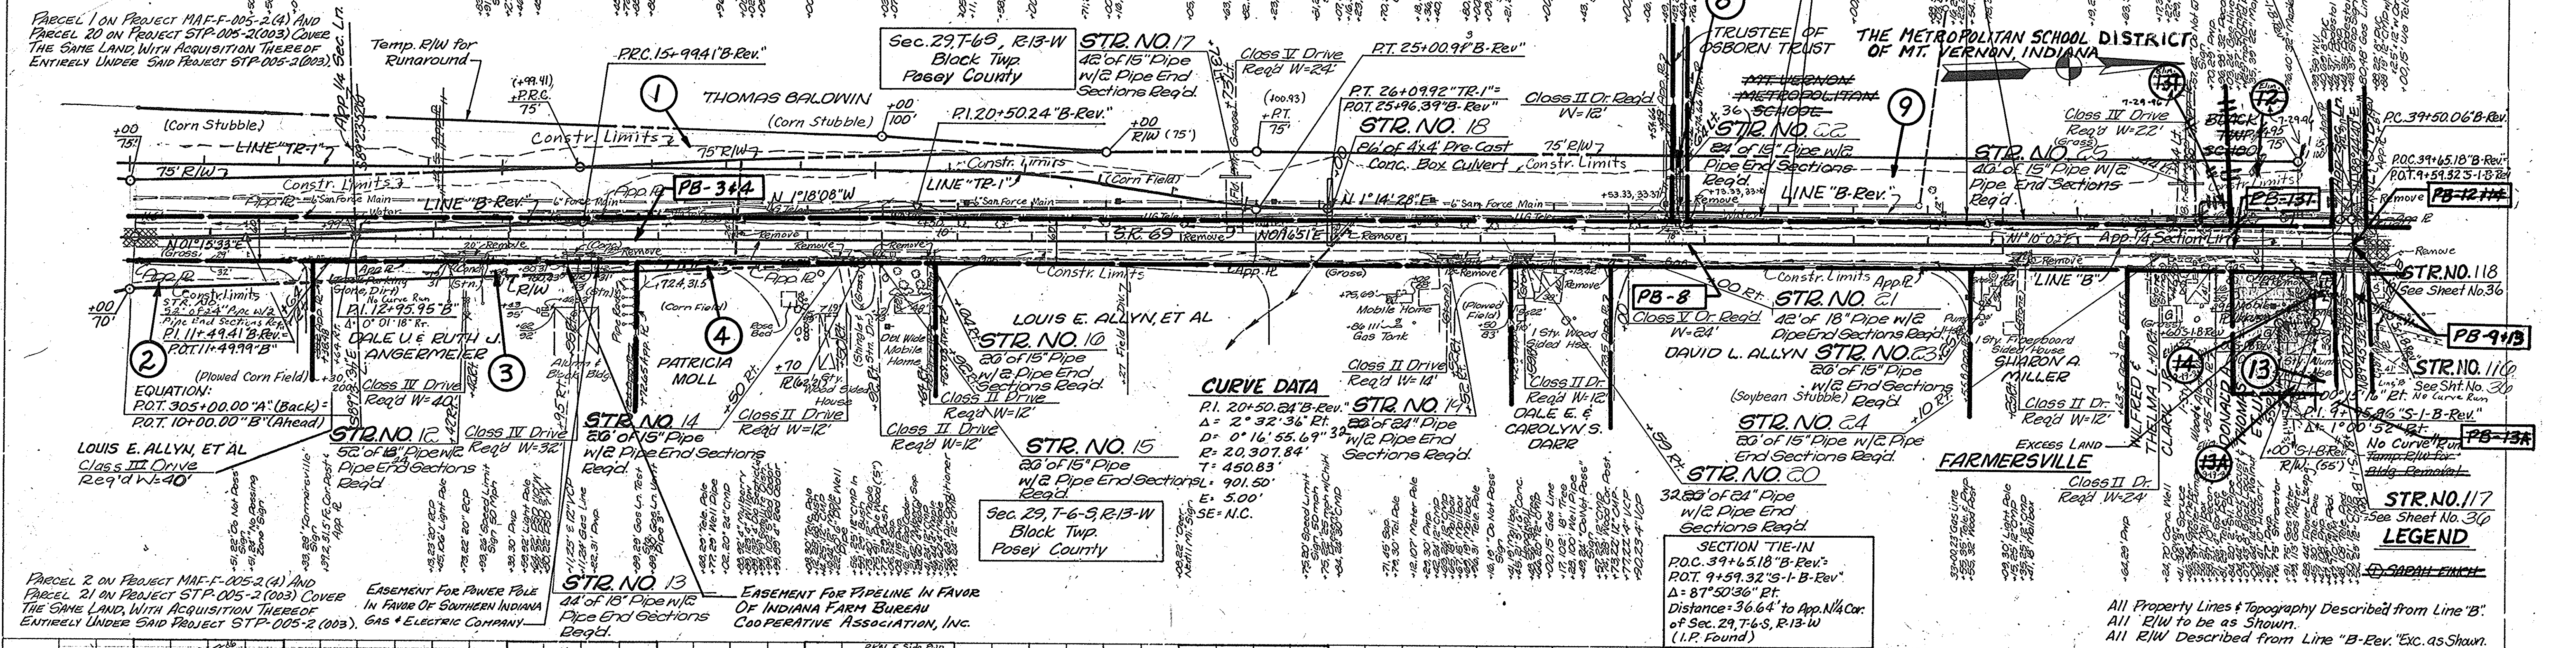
PLAN - PROFILE R. R. STANDARD 1975
